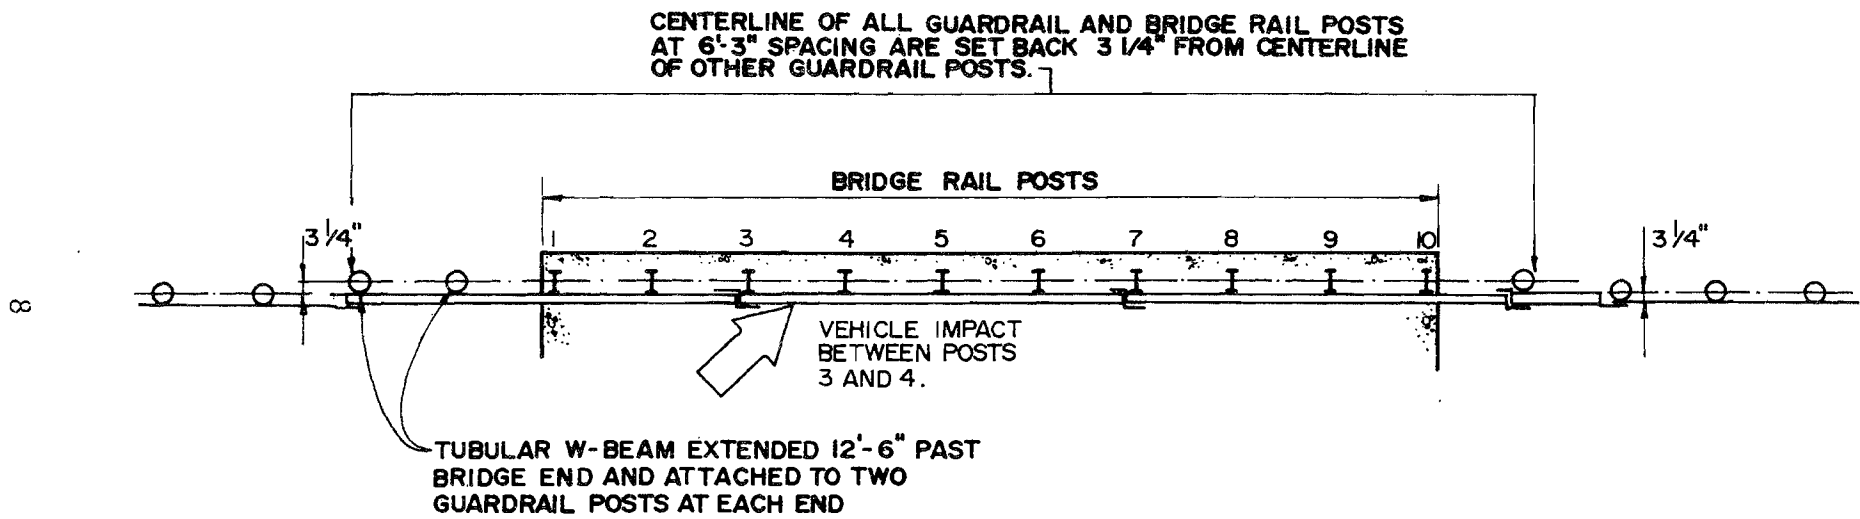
PLAN VIEW OF TUBULAR W- BEAM BRIDGE RAIL INSTALLATION.
